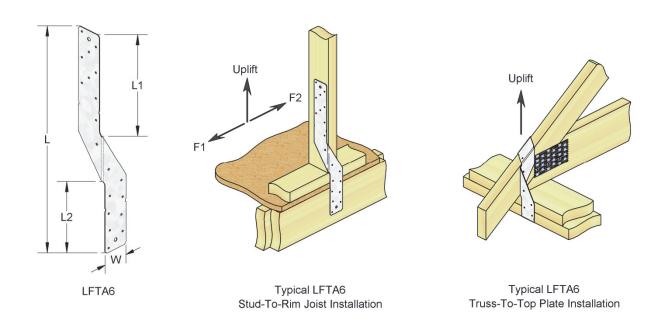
DIMENSIONS AND INSTALLATION OF LFTA6 STRAP TIE
